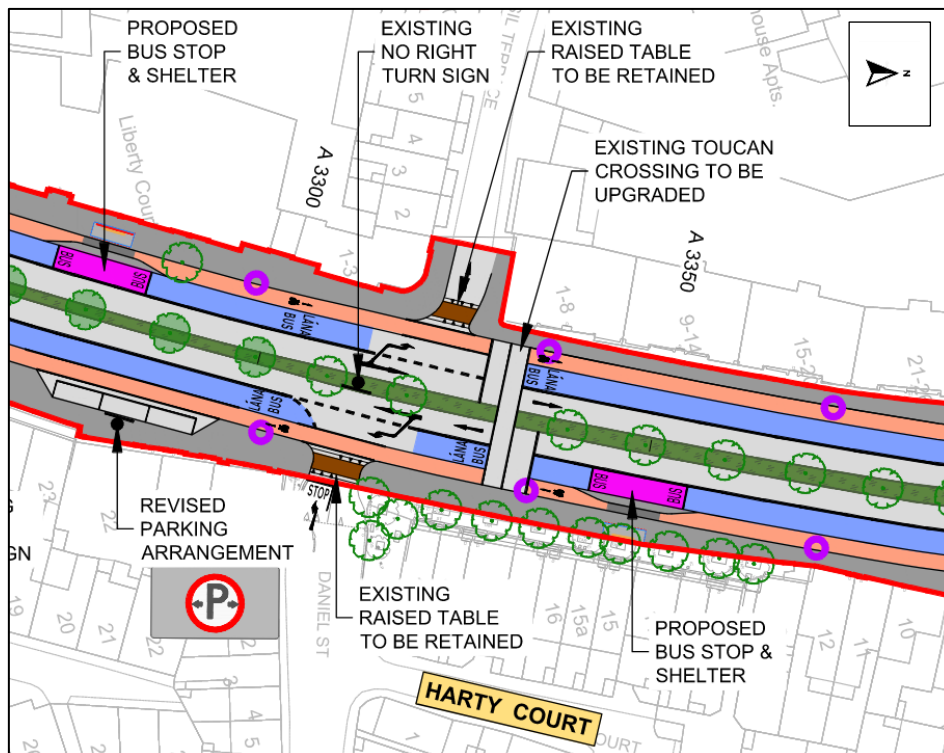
Typical Proposed Road Layout on Dual Carriageway Section of Clanbrassil Street Lower & New Street South
